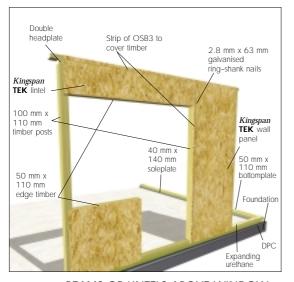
BEAMS OR LINTELS ABOVE WINDOW AND DOOR OPENINGS
